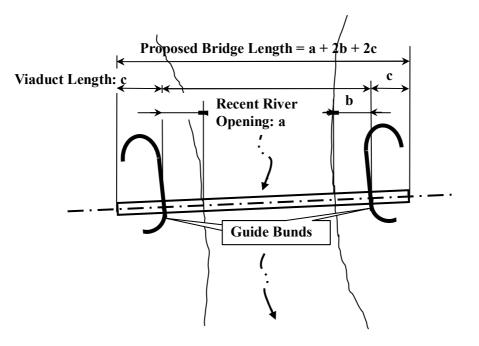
Dimensional Factors for Proposed Bridge Length
